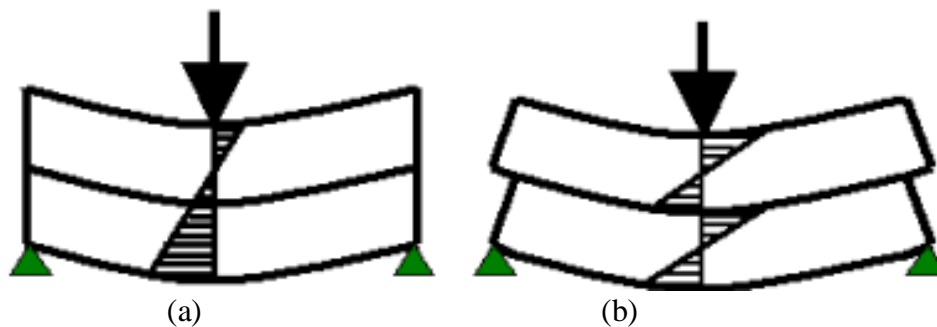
Stress distribution: (Gomba et al., 2004): (a) Fully Bonded Pavement Acting as One Structure (b) Debonded Pavement Acting as Two Systems.
